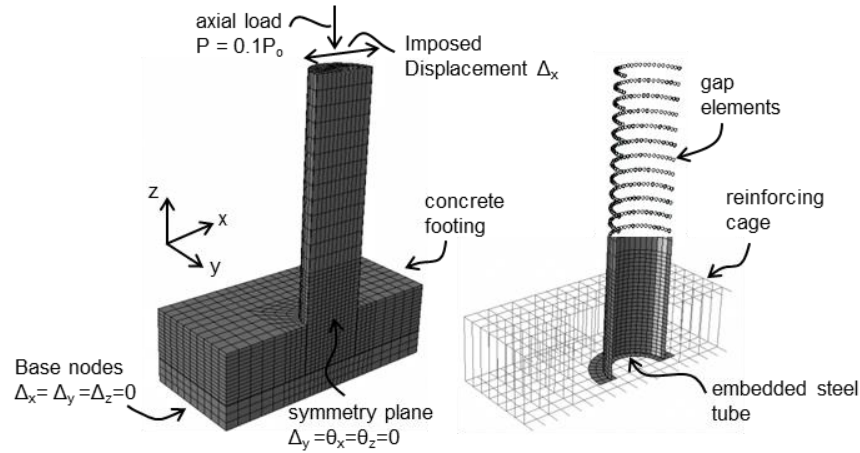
Overview of Finite Element Model of CFT Column-to-Foundation Connection
